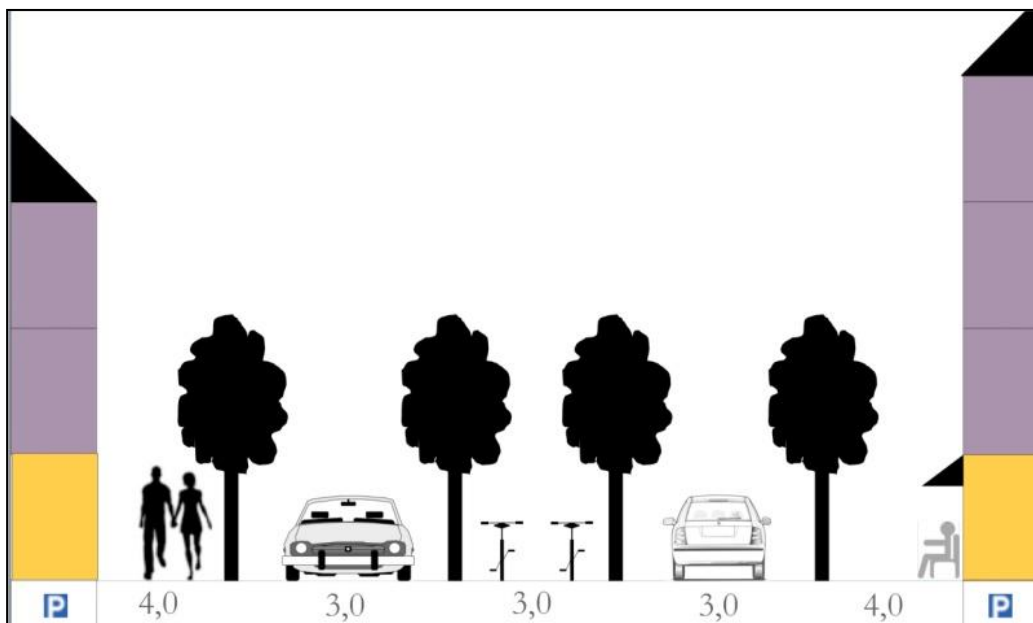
This cross section of the main road shows how the travel systems are separated, as well as how commercial buildings are mixed with residential units. Yellow represents commercial functions and purple residential units. The buildings have underground parking spaces.
